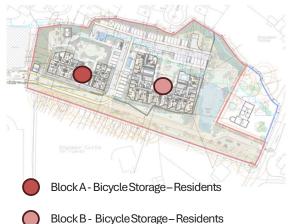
Proposed Site Plan with Ground Floor– Bicycle Storages
